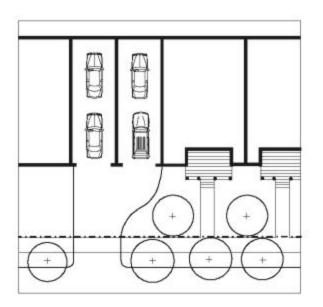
Figure Exception to 20.50.410(E)(2): Illustration of tandem parking.
